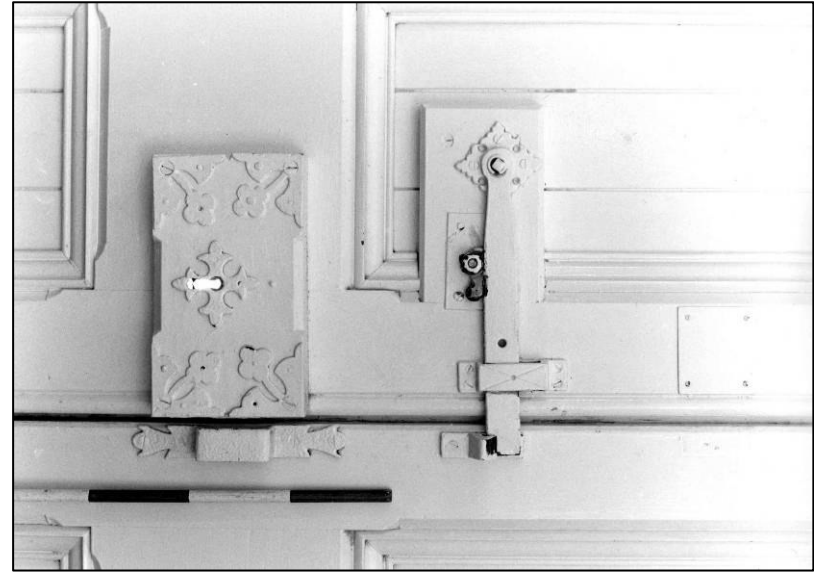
Church: GF entrance foyer S doors, detail of fittings, looking S (photo 1/11) (top to right).
